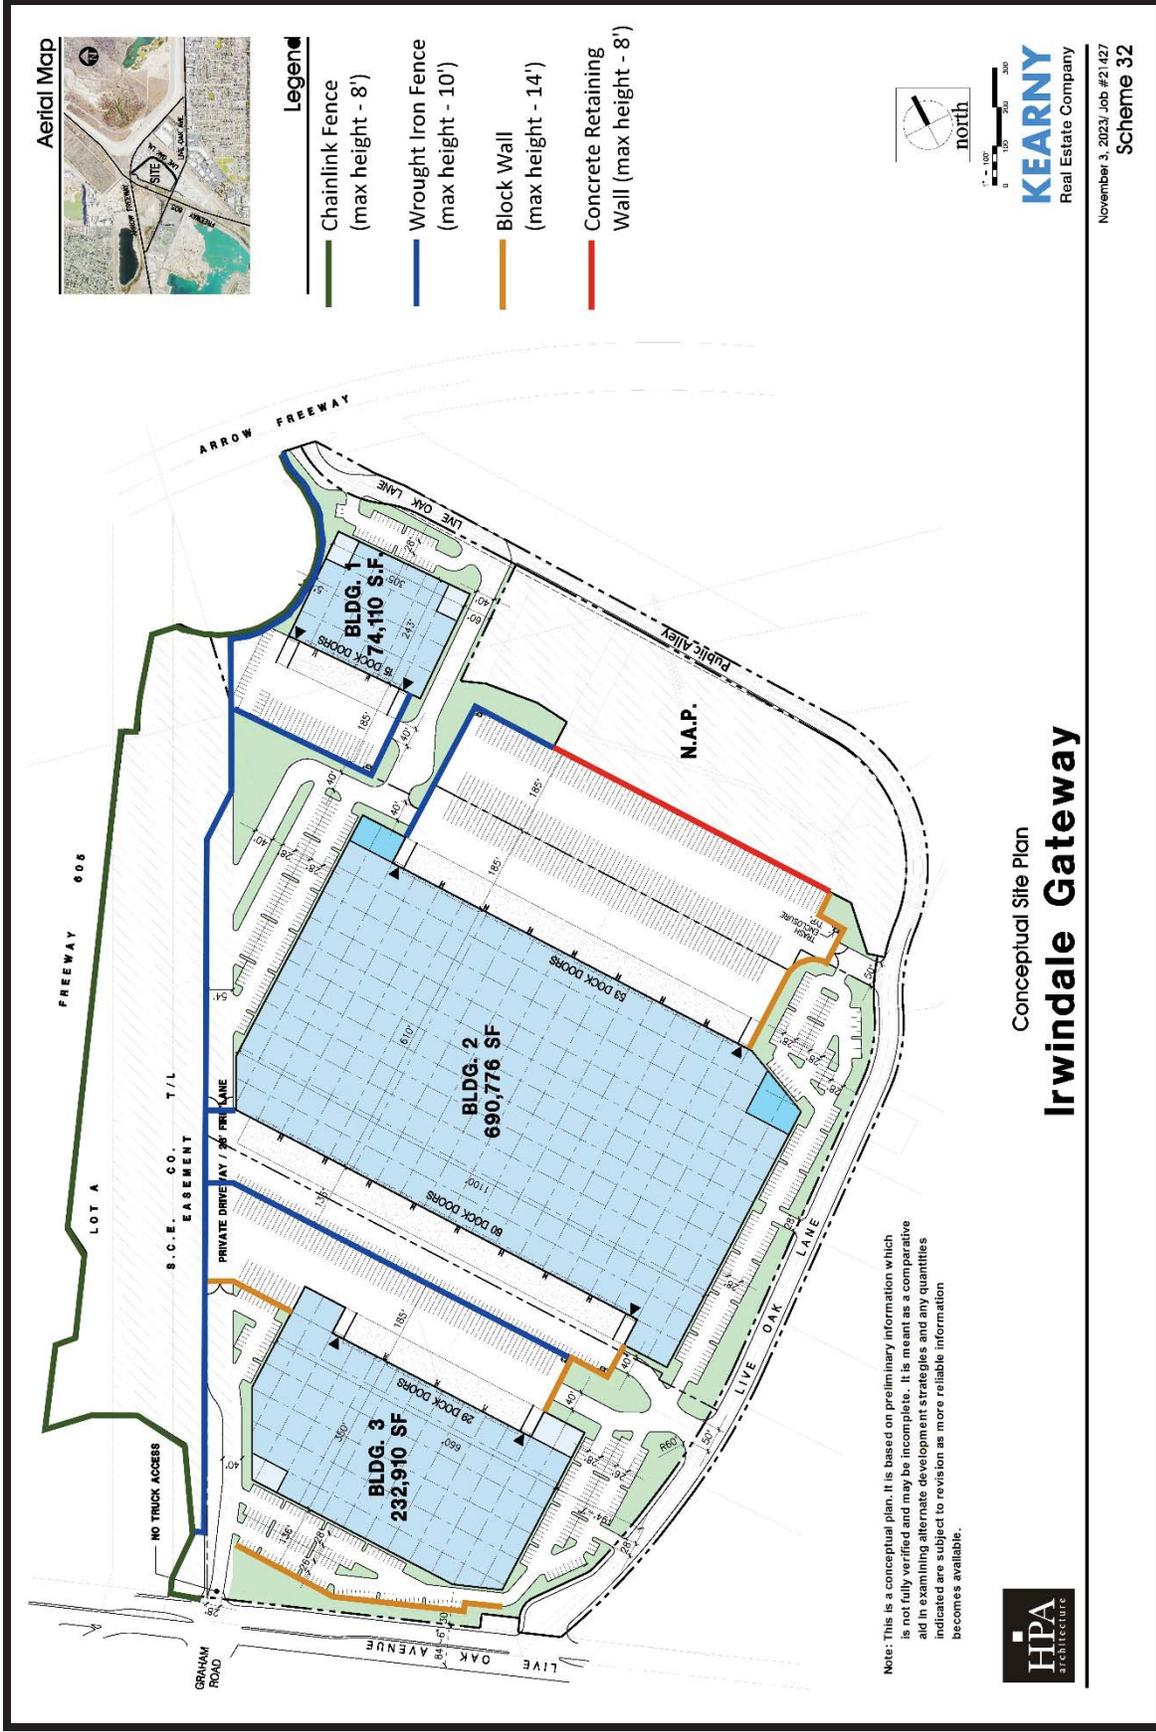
FENCE AND WALL PLAN WITHOUT BESS
